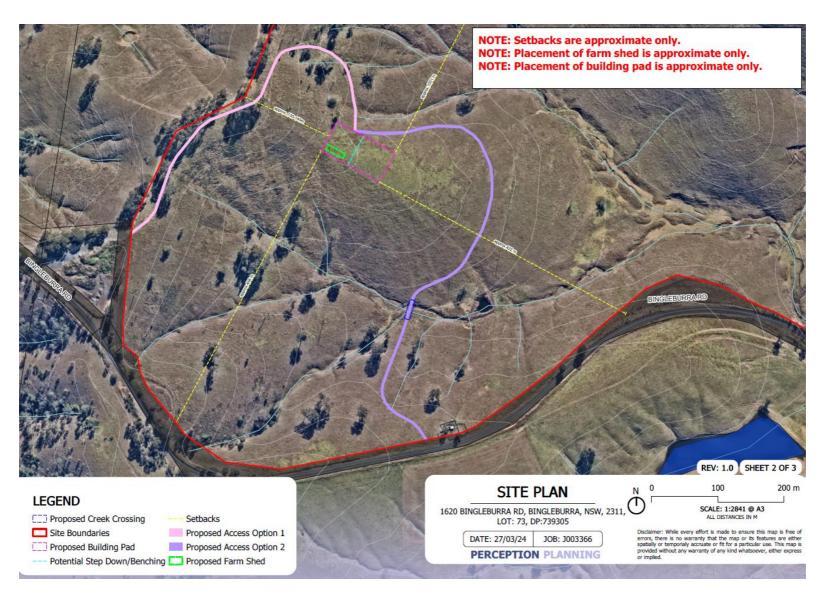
Site Plan – Sheet 2 (Perception Planning 2024)
